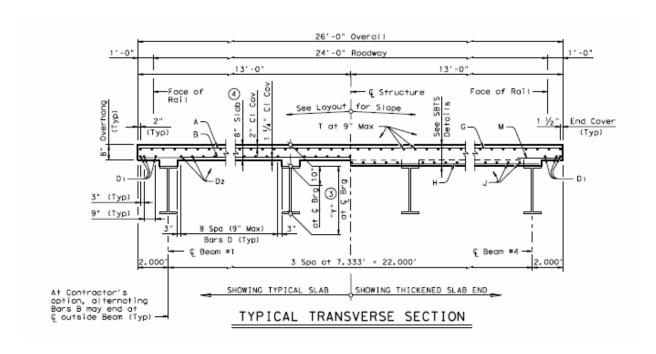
Texas Typical Transverse Section Example 24 ft Width
